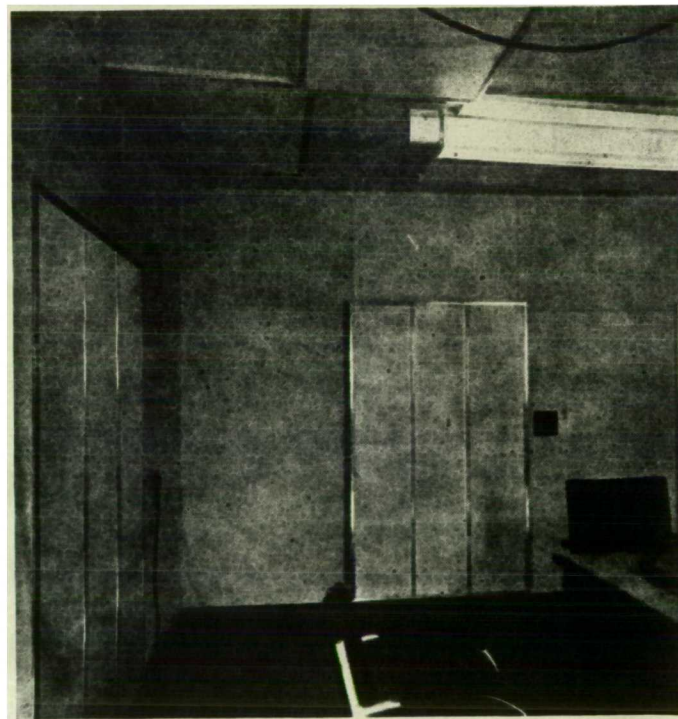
Membrane absorbers with glass-fibre covers in a talks studio (3G Egton House) wall units tuned to 120 c/s (left hand wall) and 200 c/s (far wall). Recessed ceiling units tuned to 60 c/s and 90 c/s
